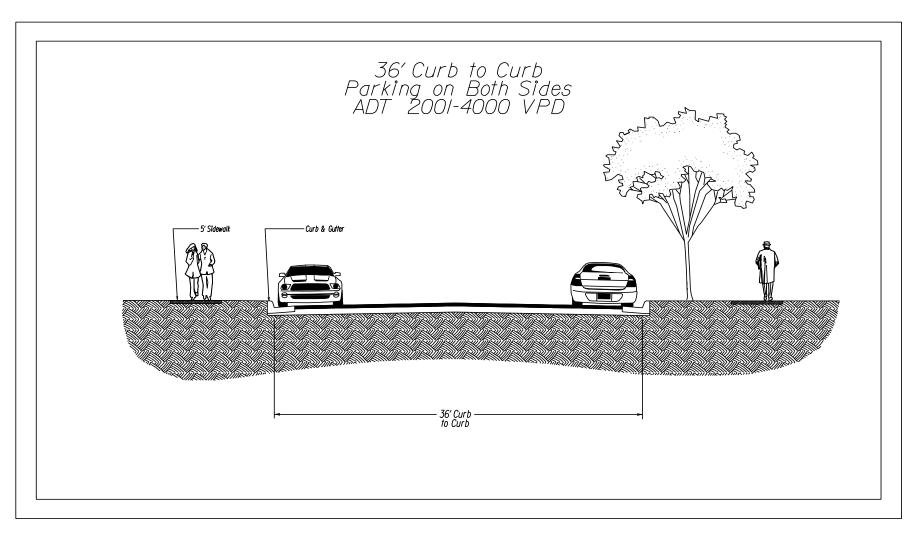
36' CURB TO CURB PARKING ON BOTH SIDES\
